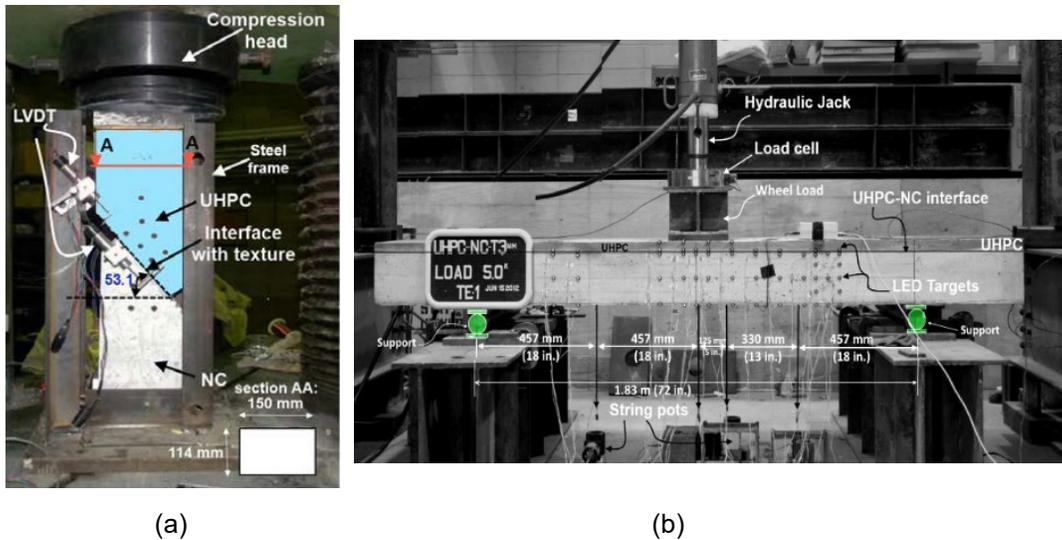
Test specimens: (a) slant shear bond test; and (b) flexural test on a precast concrete deck with UHPC overlay (Aaleti et al., 2019).
